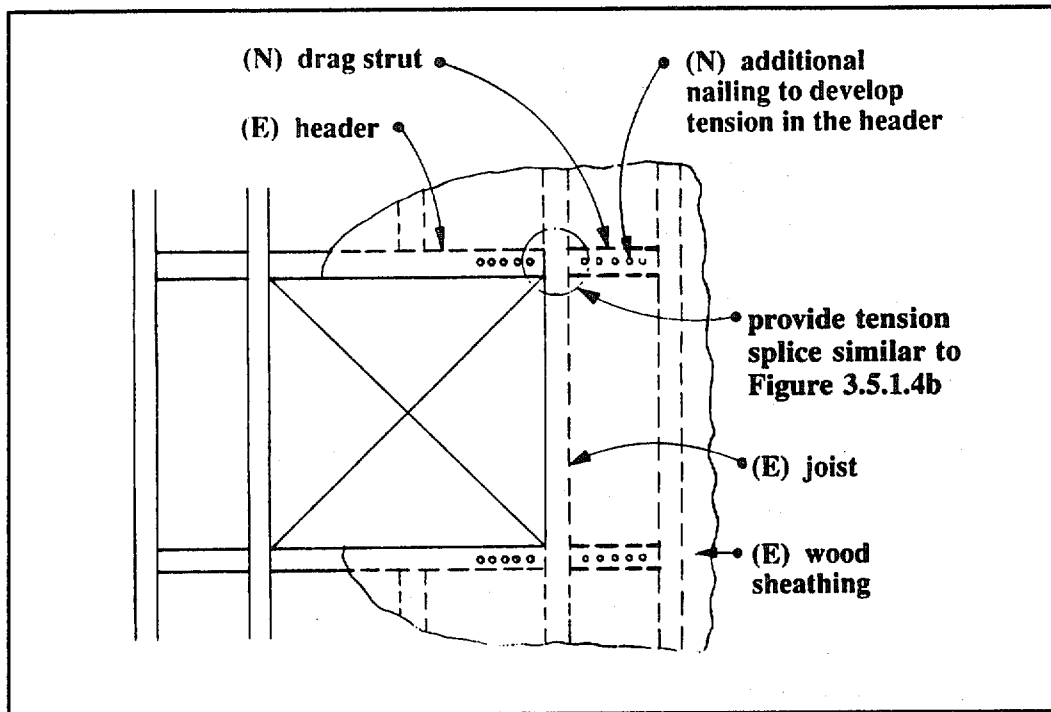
Reinforcement of an opening in an existing timber diaphragm.
